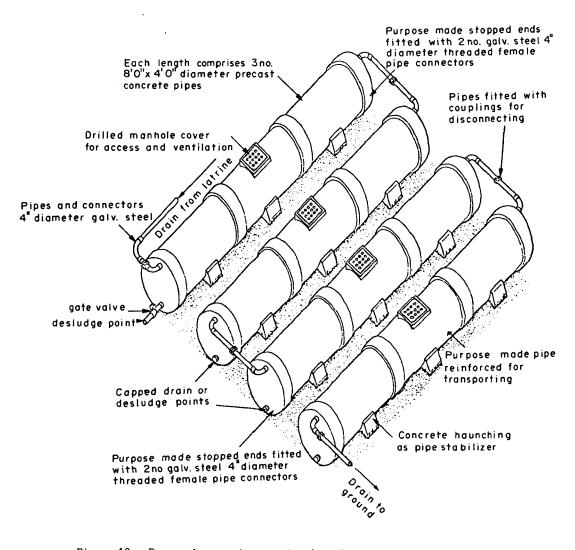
Proposed precast concrete pipes to replace existing butyl tanks in the Type 2 units
